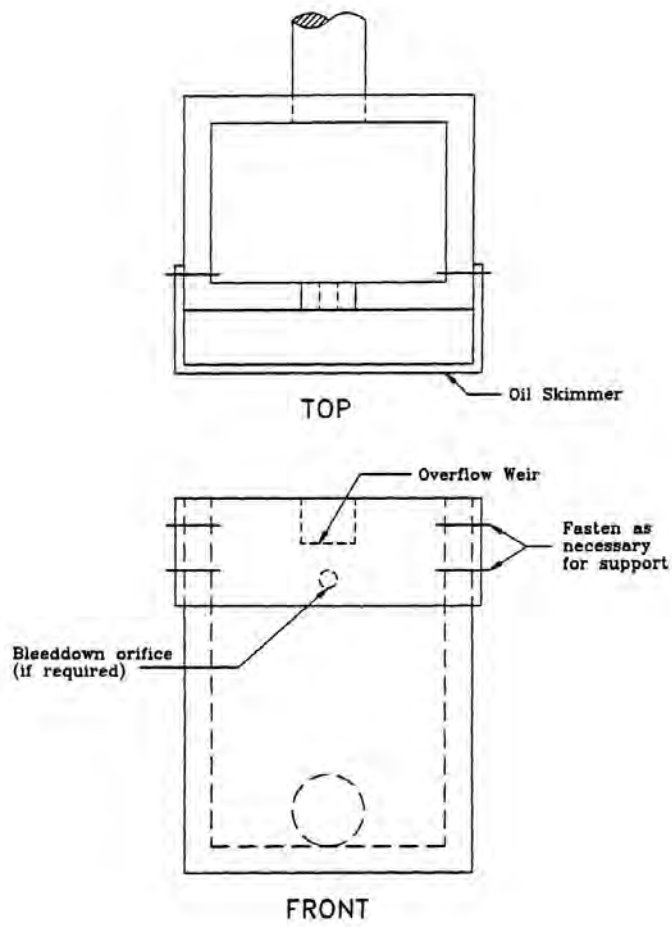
Oil Skimmer Detail for a Typical Outfall Structure (N.T.S.)
